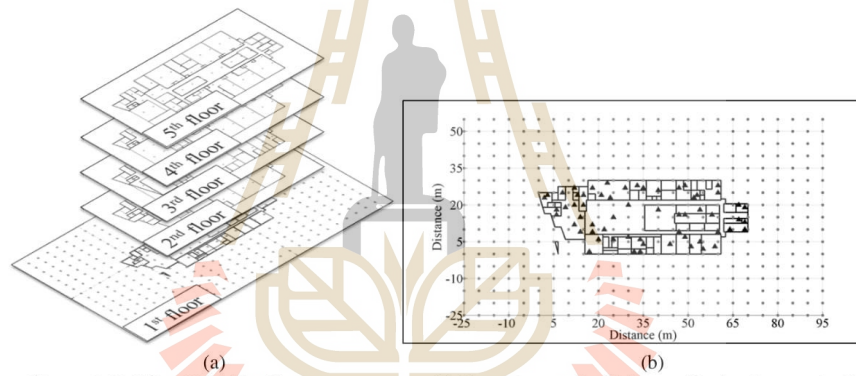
Building B (a) The five-story structure. (b) Floor plan on the 1st floor with signal test point (● in and indoor area), leakage signal test point (● in an outdoor area) and indoor users (▲).
